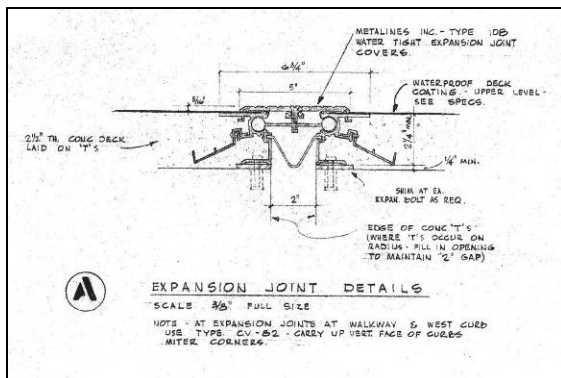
As built details of the expansion joints. In most locations this configuration no longer exists.
